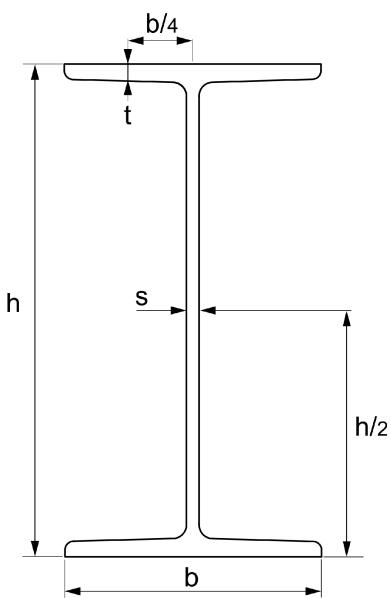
Taper flange I sections IPN, J and extra wide flange beams HLZ
